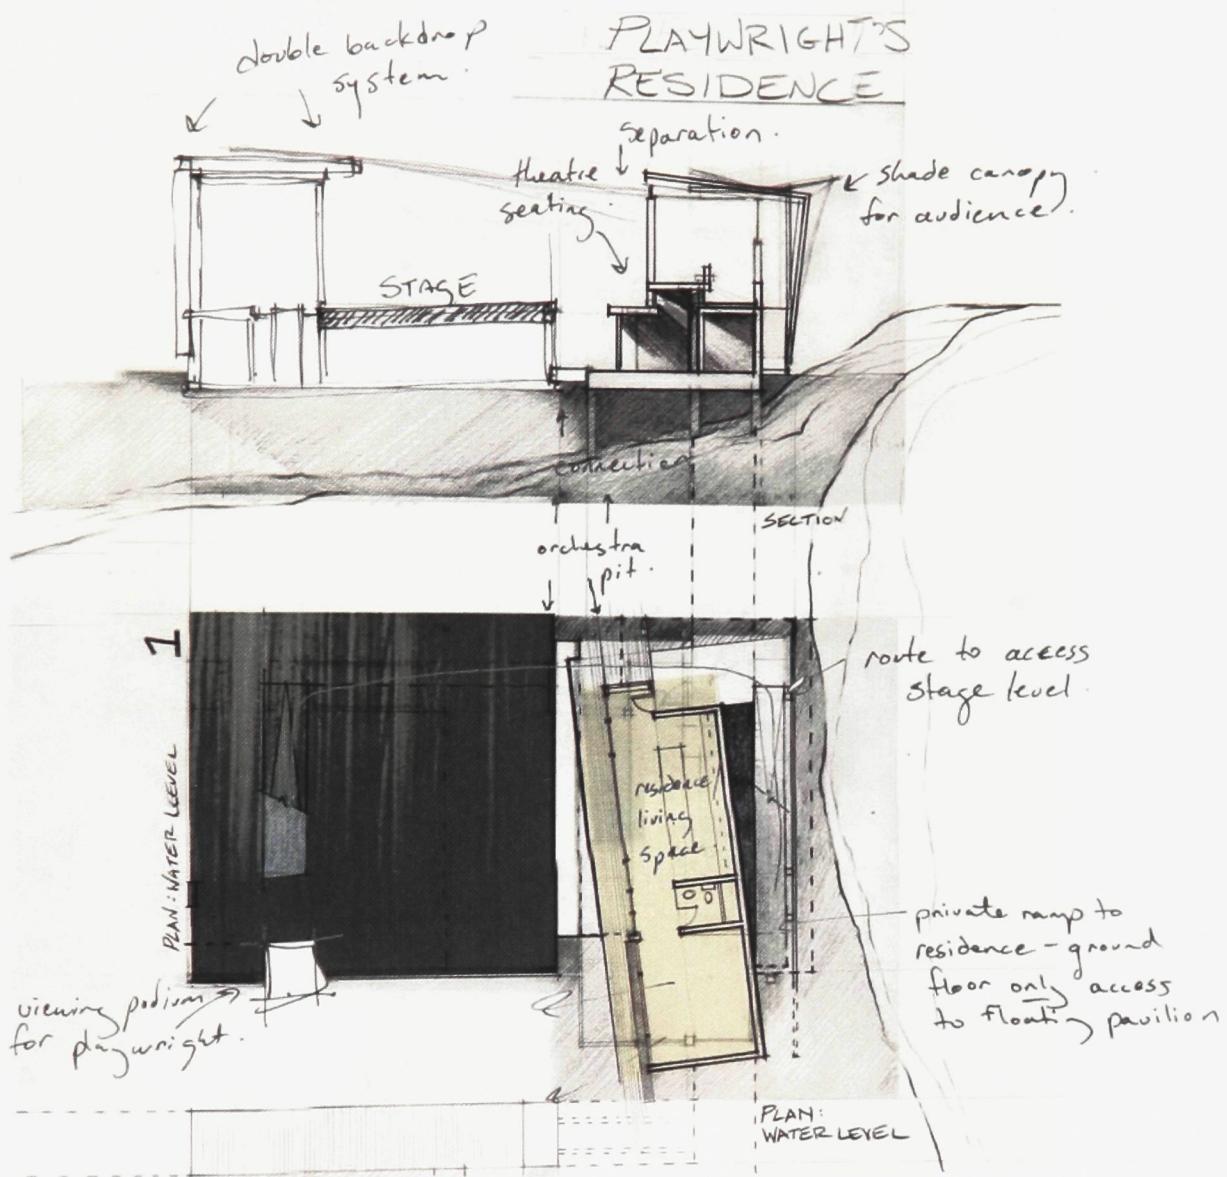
Plan and section of playwrights' residence and floating pavilion connection, 2006, created by author.
